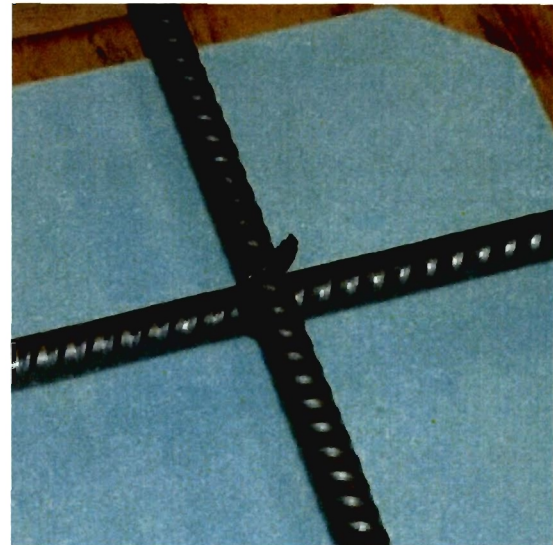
Typical 4 bar reinforced ponding specimen.
